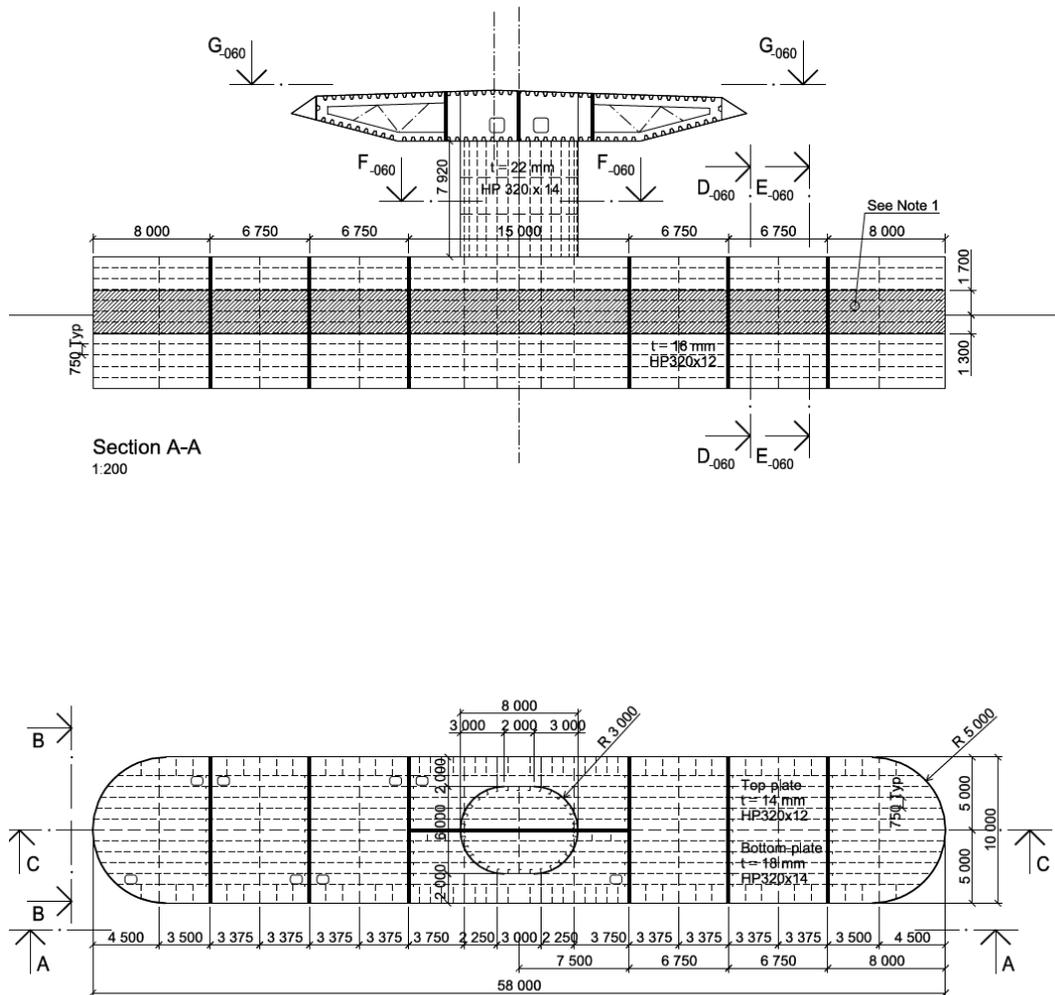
Structural arrangement and main scantlings pontoon type 1 (low bridge, -DR-054, ref. Appendix A
